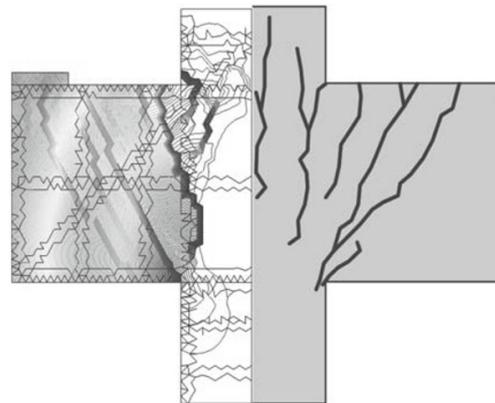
Multiple embedded cracks in reinforced concrete structure
